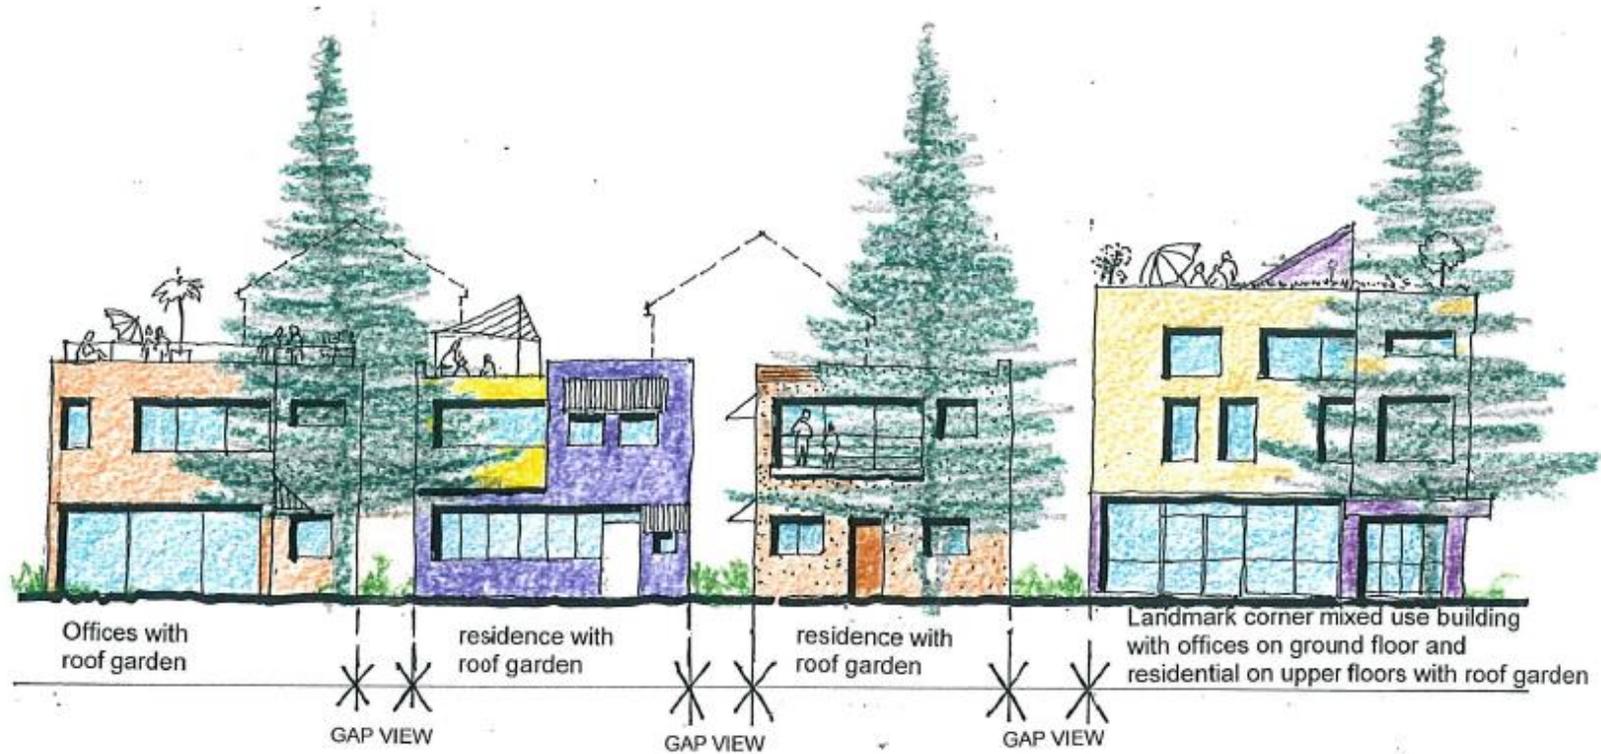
By utilising the site levels, the views for buildings on interior lots or facing Urch Street, can be achieved for upper floors and roof terraces (where appropriate see figure 3) in addition to gaps between Chapman Road frontage buildings.
